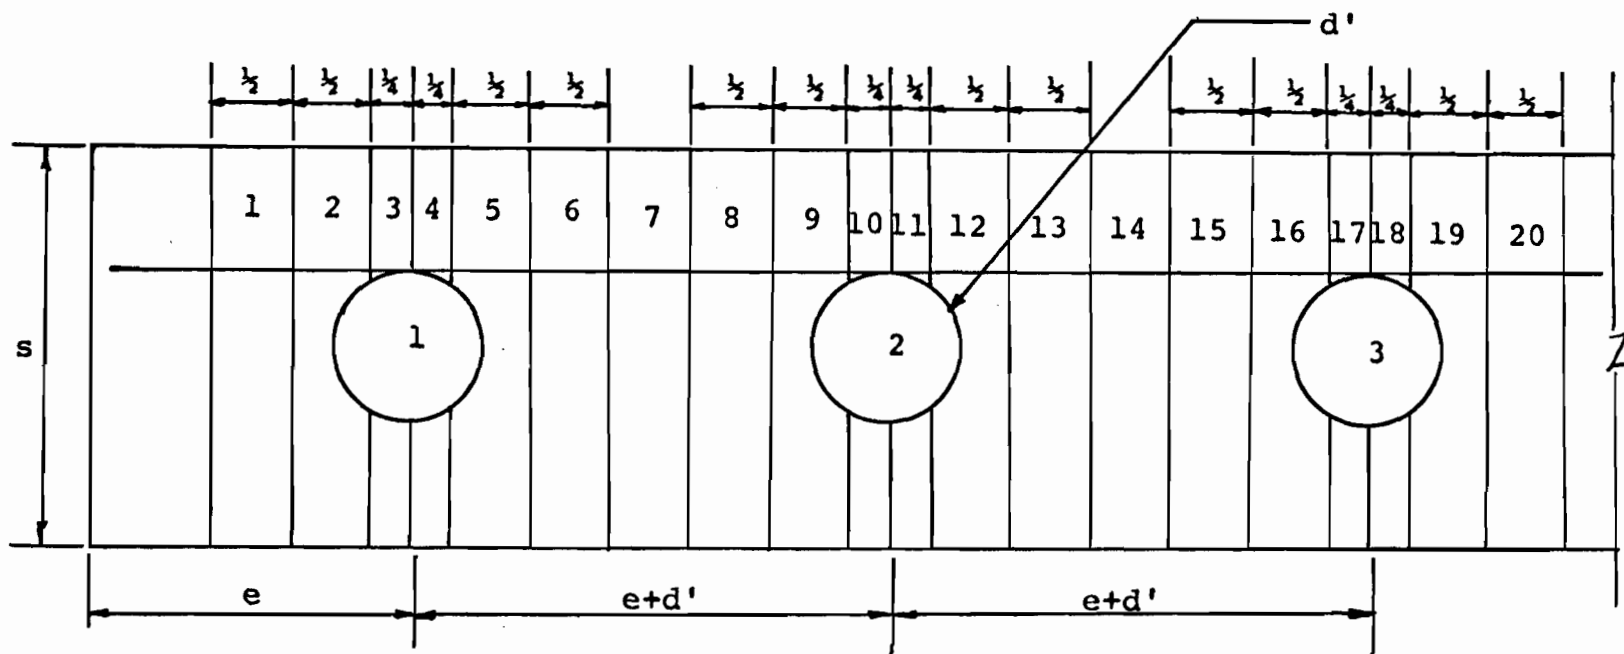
TYPICAL CONNECTION SPECIMEN.
